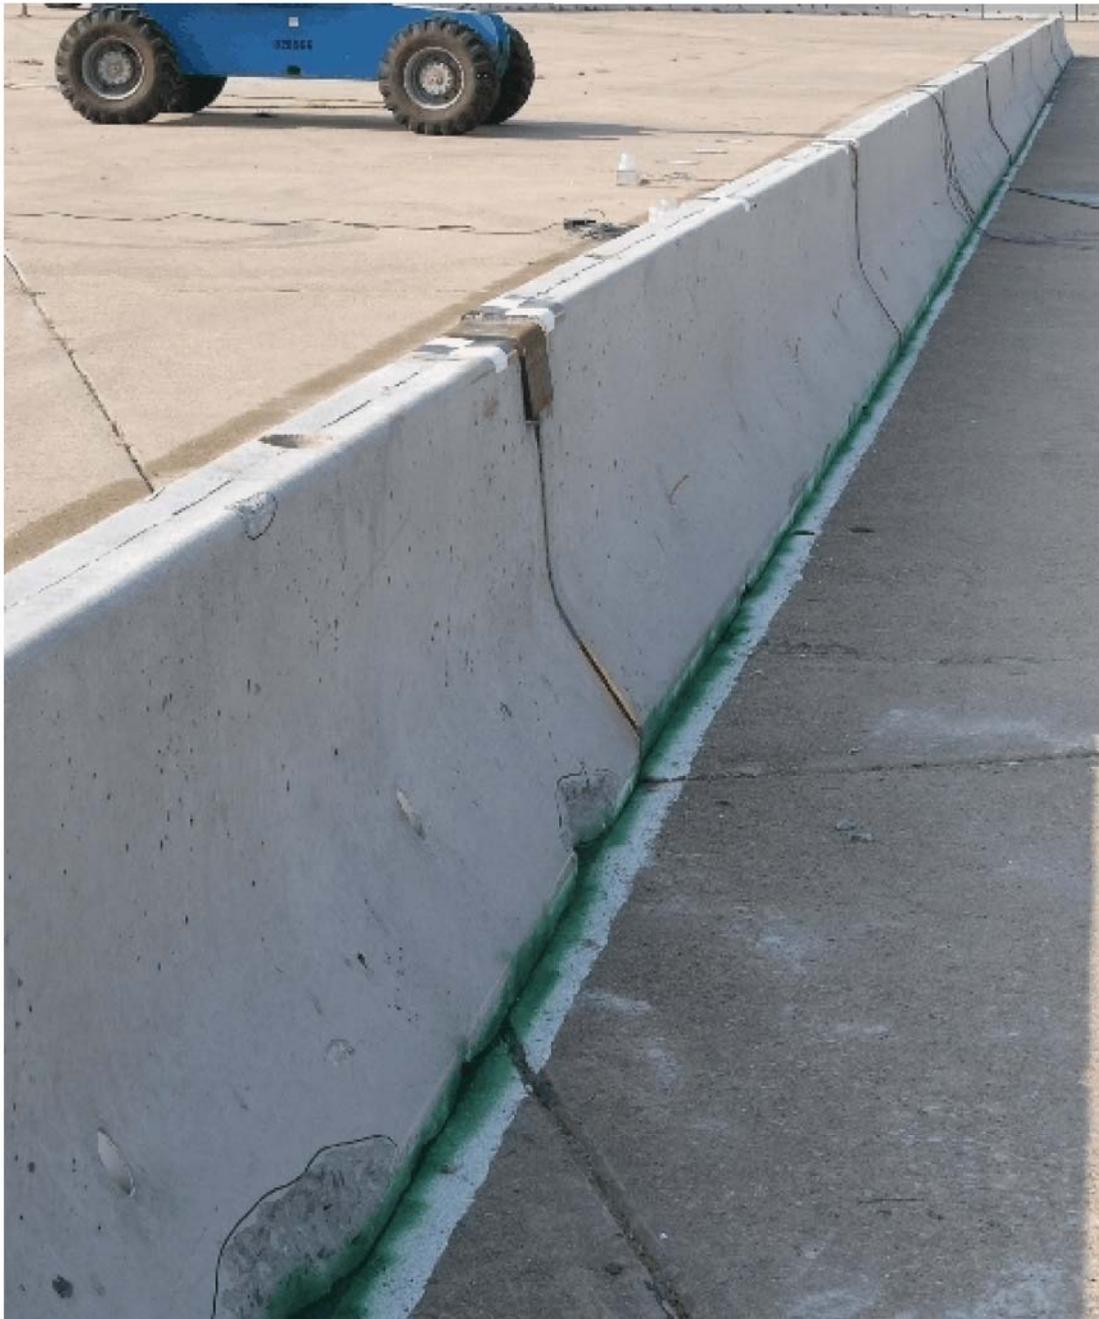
New York Temporary Concrete Barrier, Test NYTCB-2
